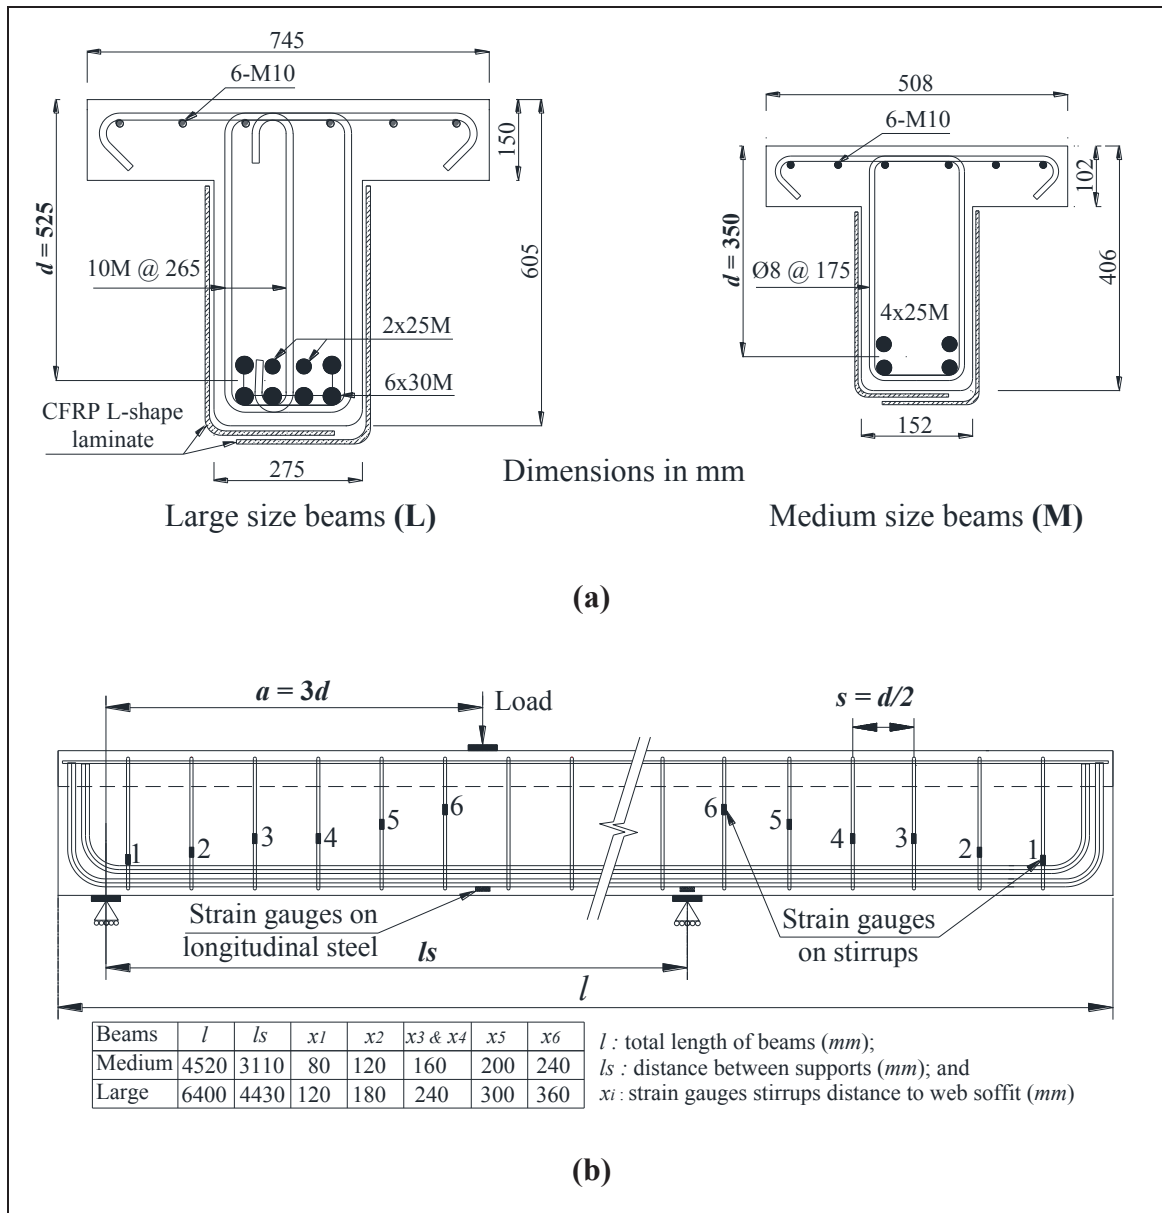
Details of beams (dimensions are in mm): (a) Cross sections of geometrically similar T-beams; (b) Typical elevation of beams and internal instrumentation
